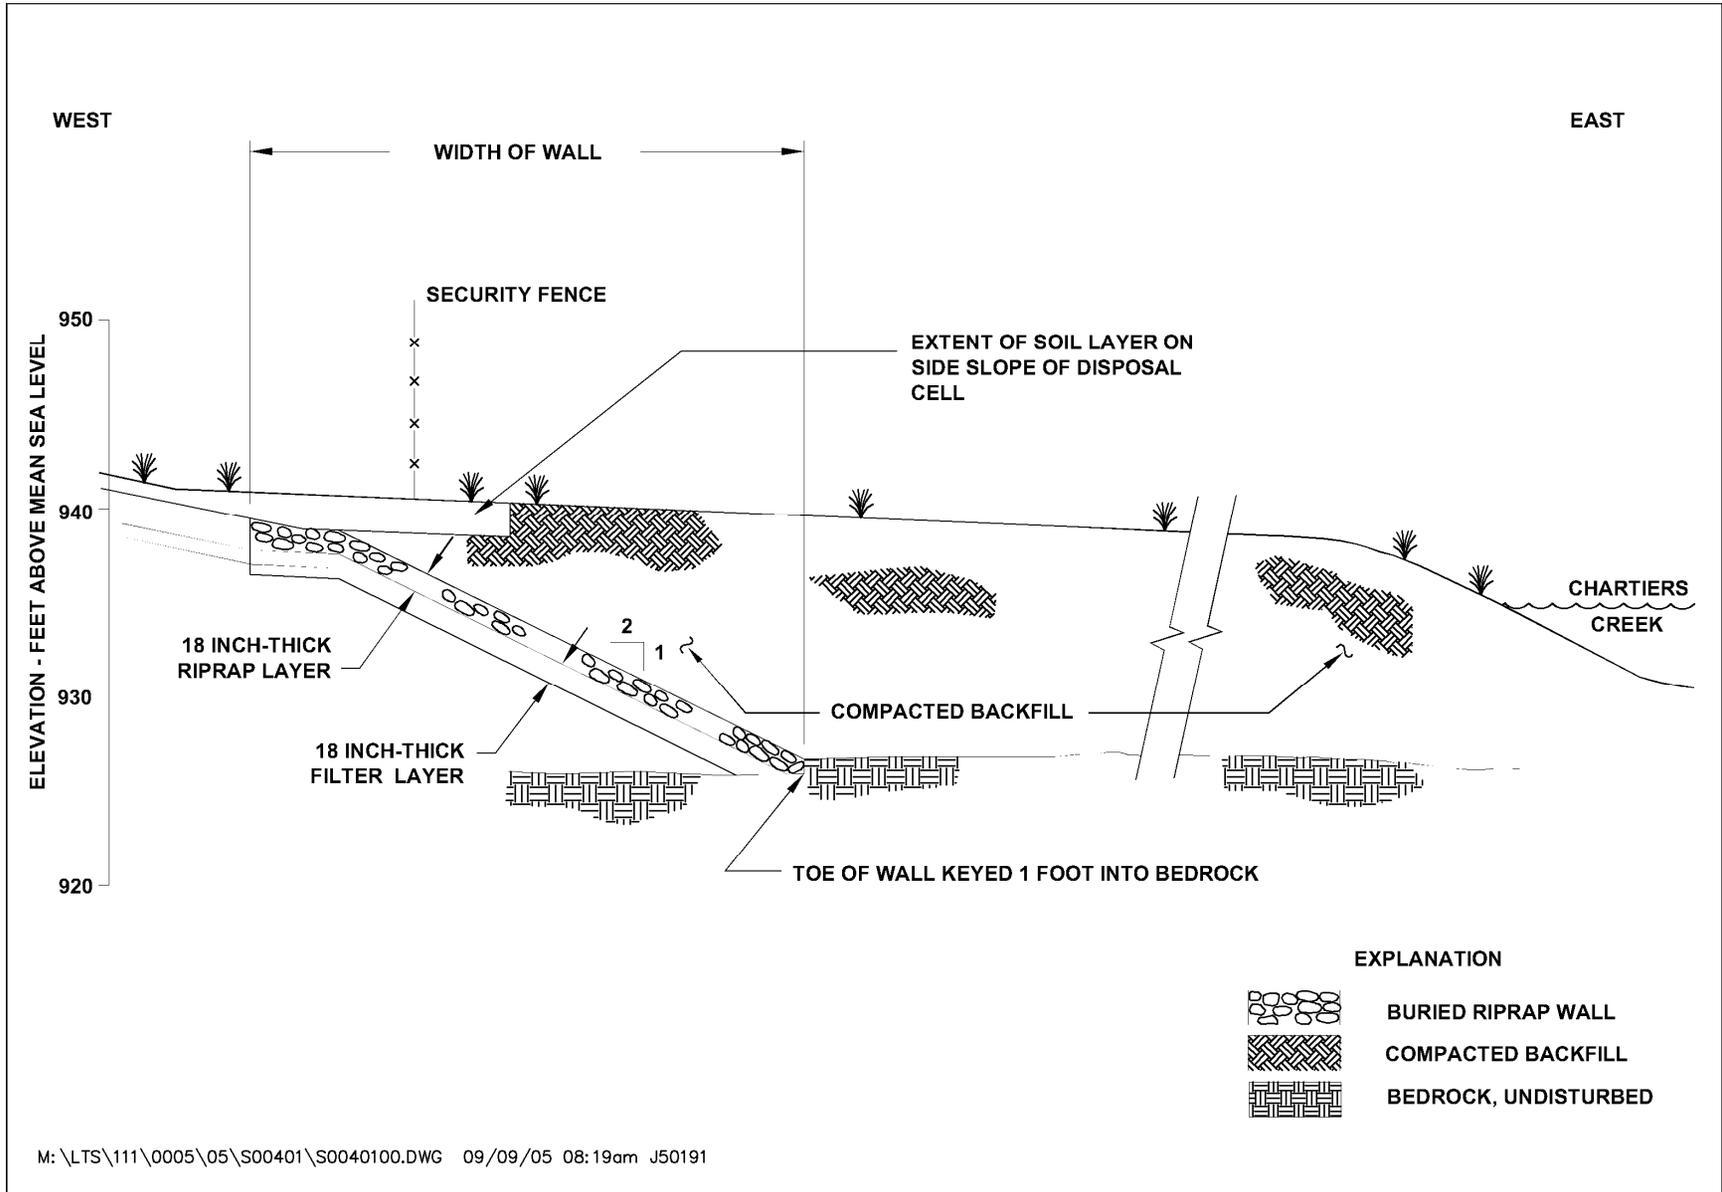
East-West Cross Section Through Buried Riprap Wall, Canonsburg, Pennsylvania, Disposal Site
